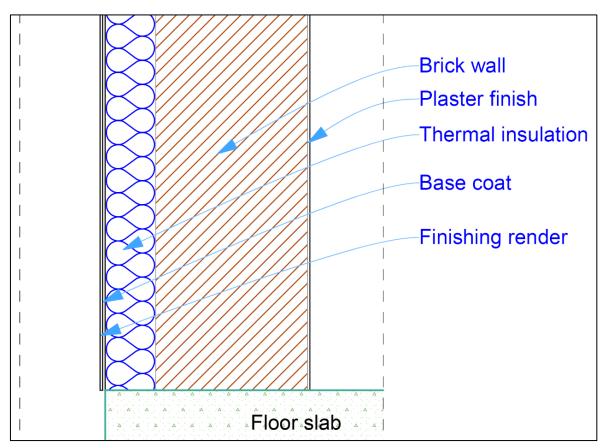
Layer details of the external load-bearing wall (D-01). Source: (By Author)
